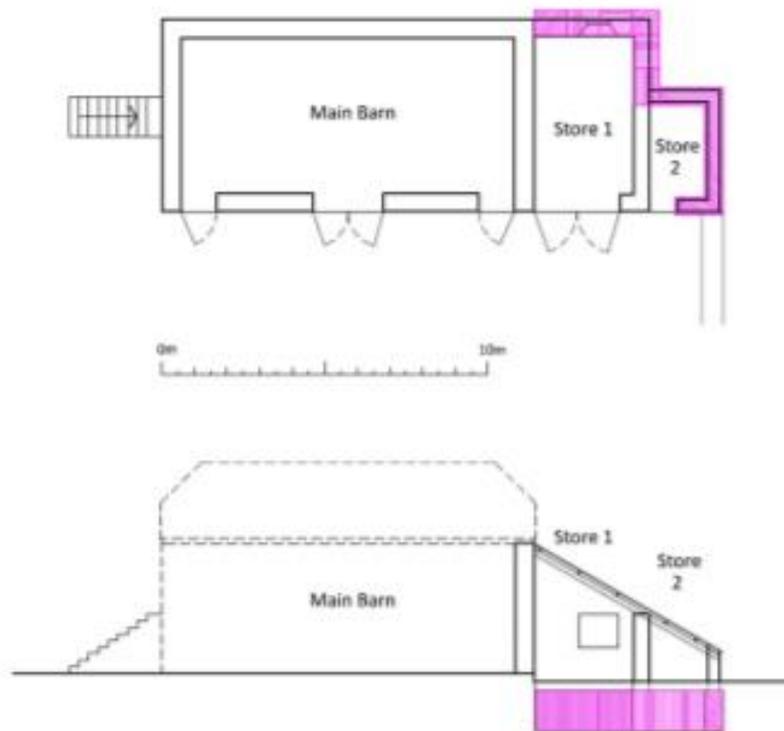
Plan of barn and stores, showing the extent of the proposed underpinning
